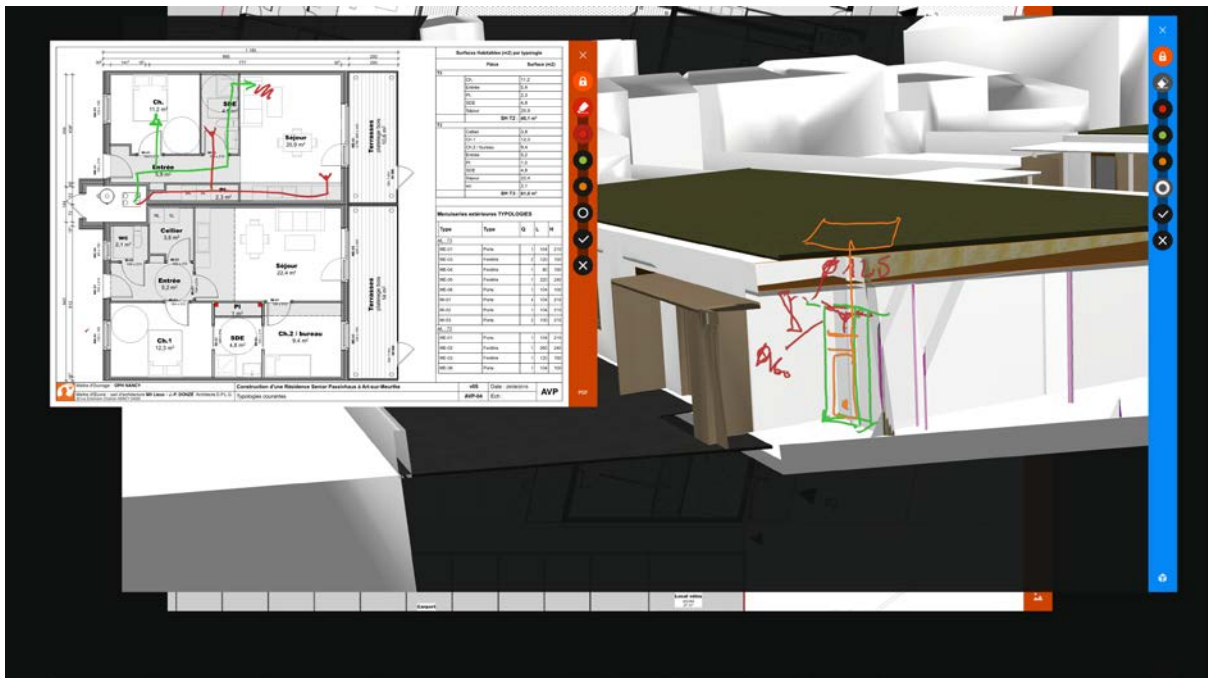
Architect M. Donzé annotating the GF plan section on the Wall.
